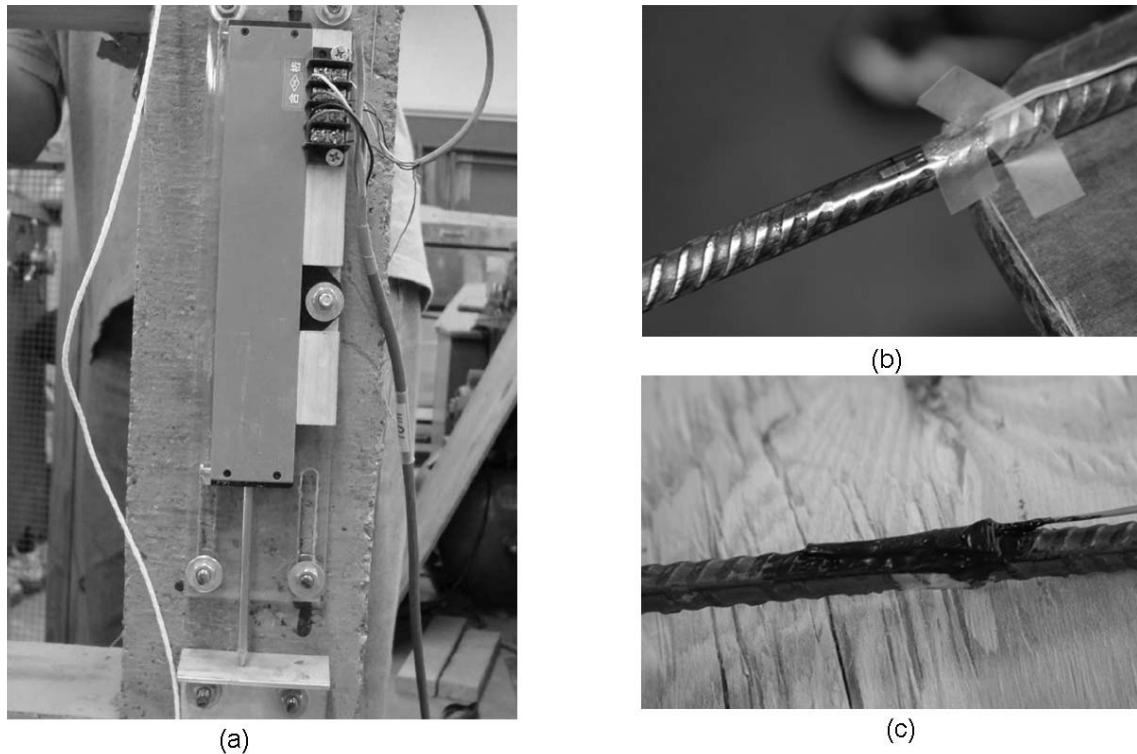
Typical LVDT used to measure concrete strains during monotonic testing (a) Typical strain gage bonded to reinforcing bar (b) and after protective coating (c)
